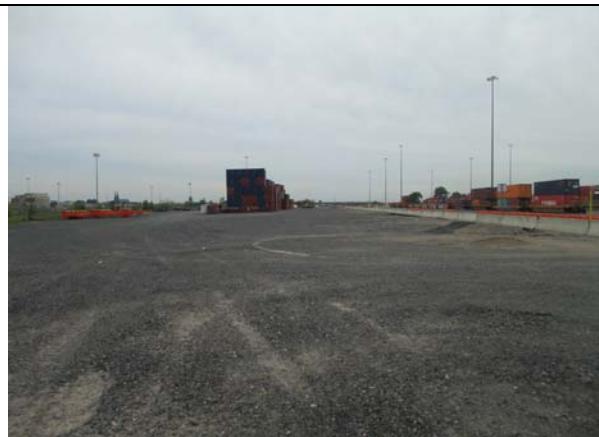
Crushed stone cover and container storage in Site 1 taken facing north.
